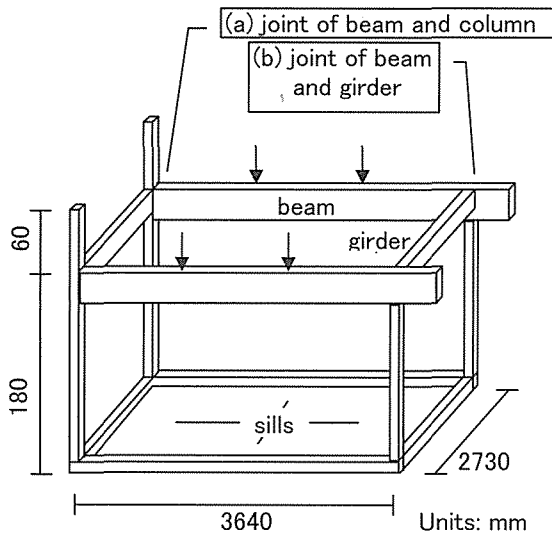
Schematic diagram of structure for tests. Arrows, loading points; joint (a) and (b), see Fig. 2.
